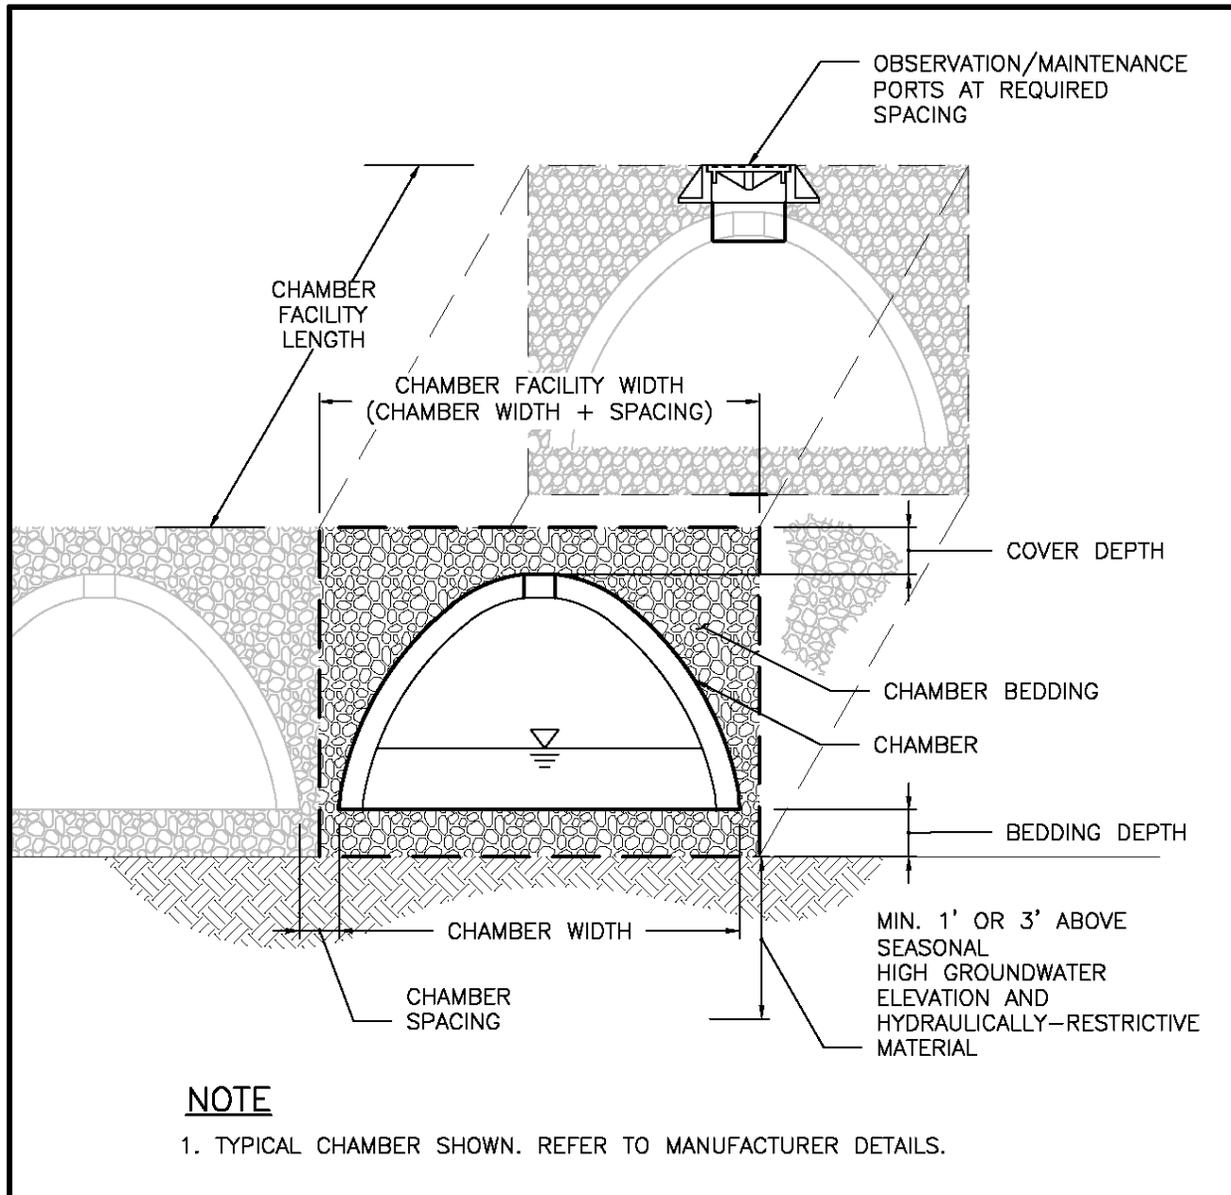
Typical Infiltration Chamber/Vault.
